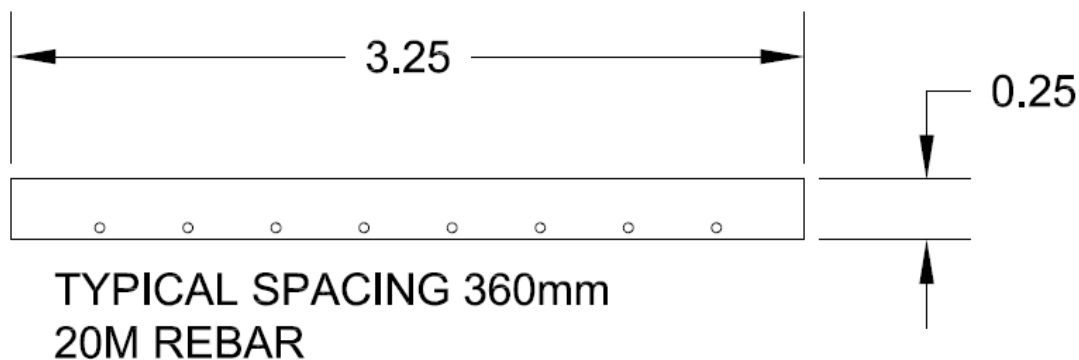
Typical Rebar Spacing for Horizontal Concrete Slabs
